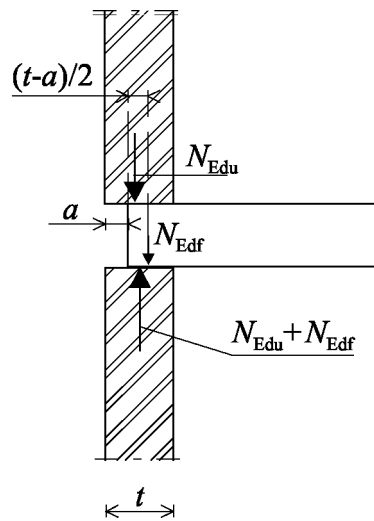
Diagram showing the forces when a floor is supported over a part of the thickness of a wall
